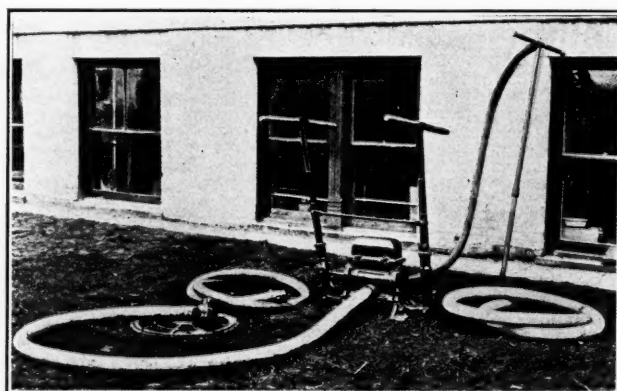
WASH DRILL OUTFIT FOR TESTING FOUNDATIONS.
